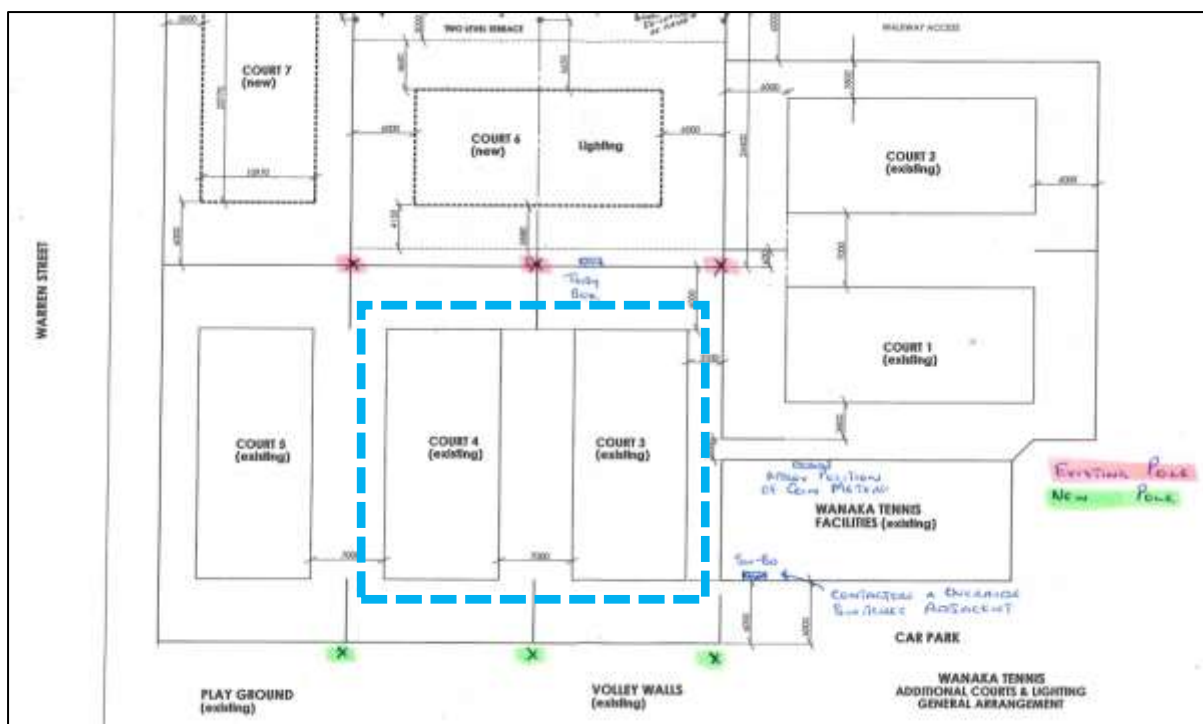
Extract of Site Plan showing Courts 3 and 4 to be illuminated. Three new poles will be erected to enable four new lights to be installed. Another four lights will be located on top of three existing poles.
